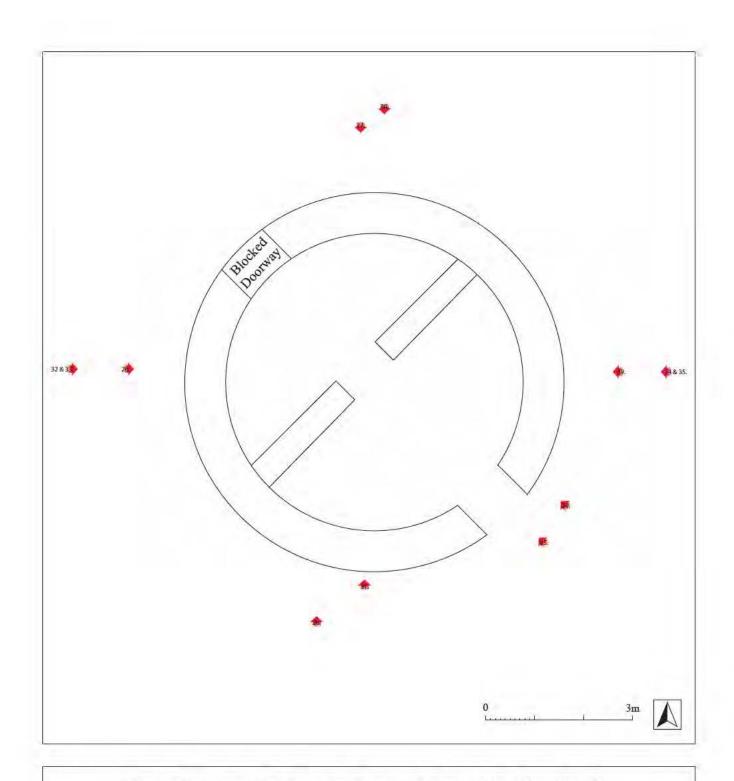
Location Plan Showing Photograph Positions for Plates 24 - 35
